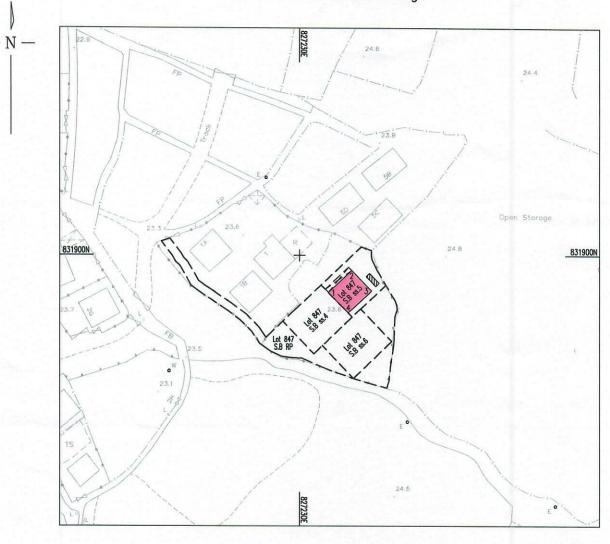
Proposed House on Lot 847 S.B ss.5 in D.D.112 Lin Fa Tei, Yuen Long
